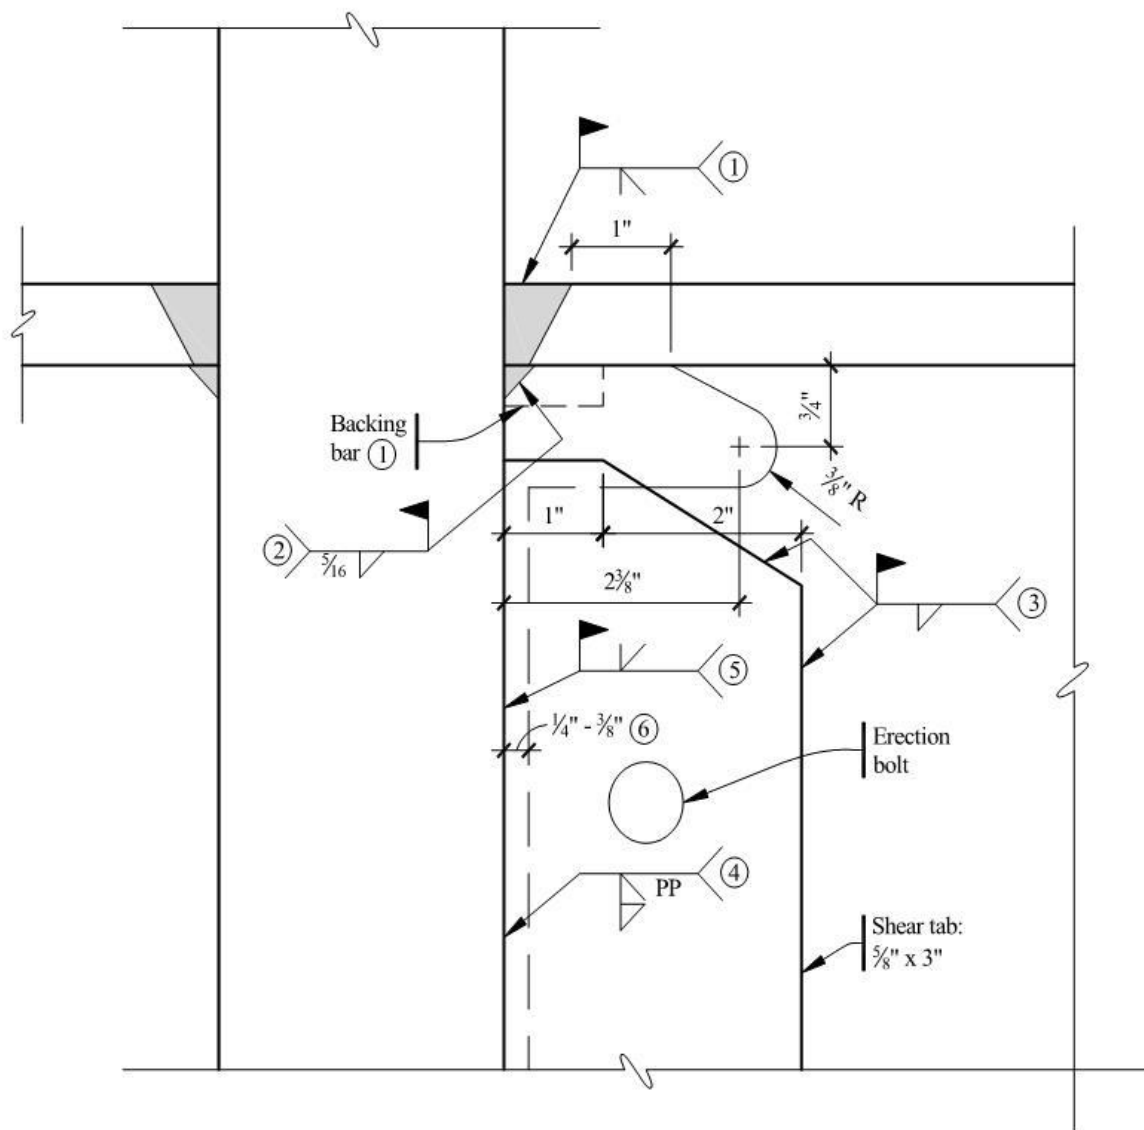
WUF-W weld detail (1.0 in. = 25.4 mm).
